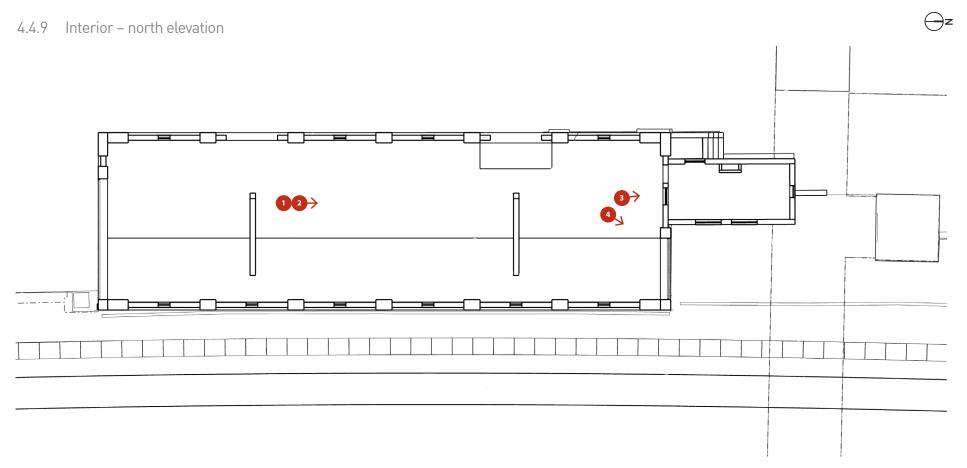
Key plan showing location and direction of photos of interior north elevation of Goods Shed
